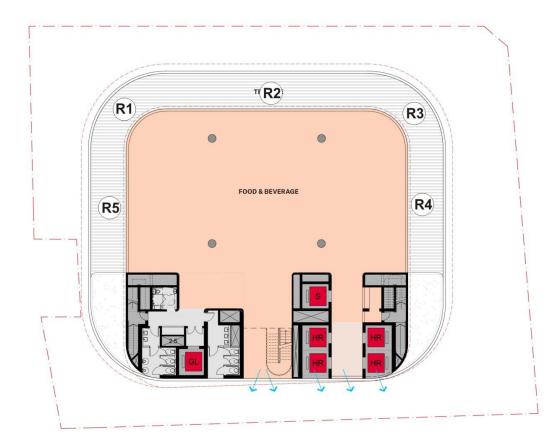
Rooftop Terrace Test Locations of the 15-23 Hunter Street and 105-107 Pitt Street Development, Sydney.
